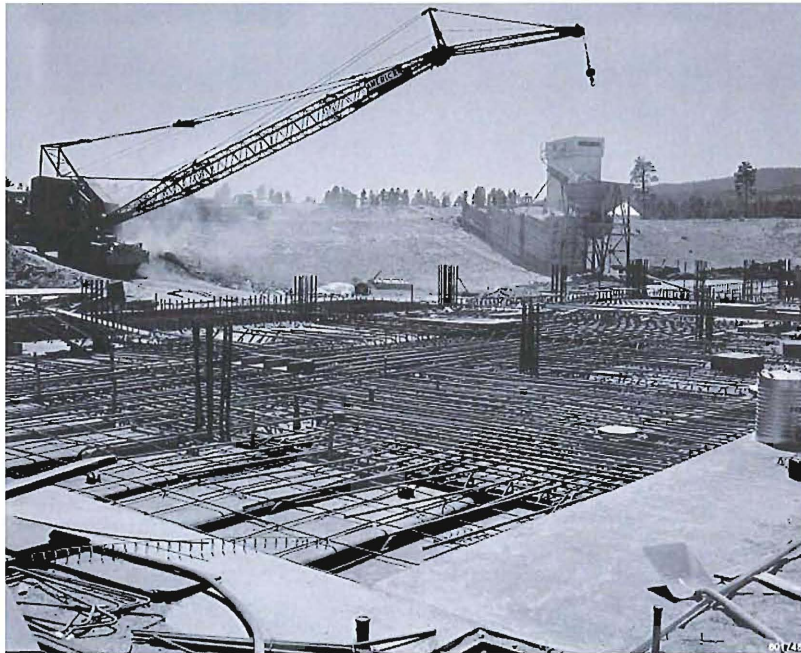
1952 construction close up; showing concrete and steel reinforcement
